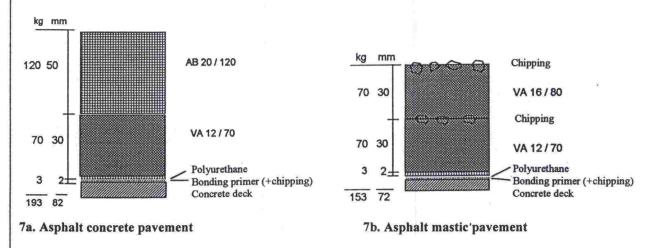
Roadway on a bridge with concrete deck. Surface structure with polyurethane waterproofing
